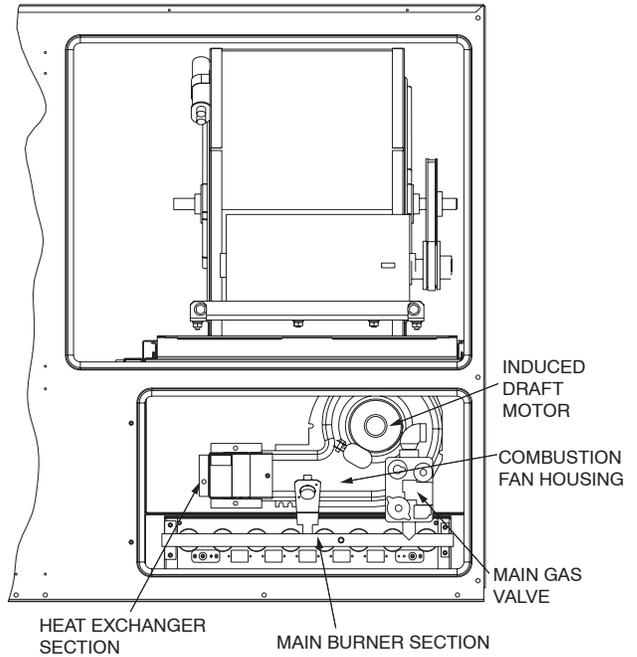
Typical Gas Heating Section (Sizes 08-14 Shown)
